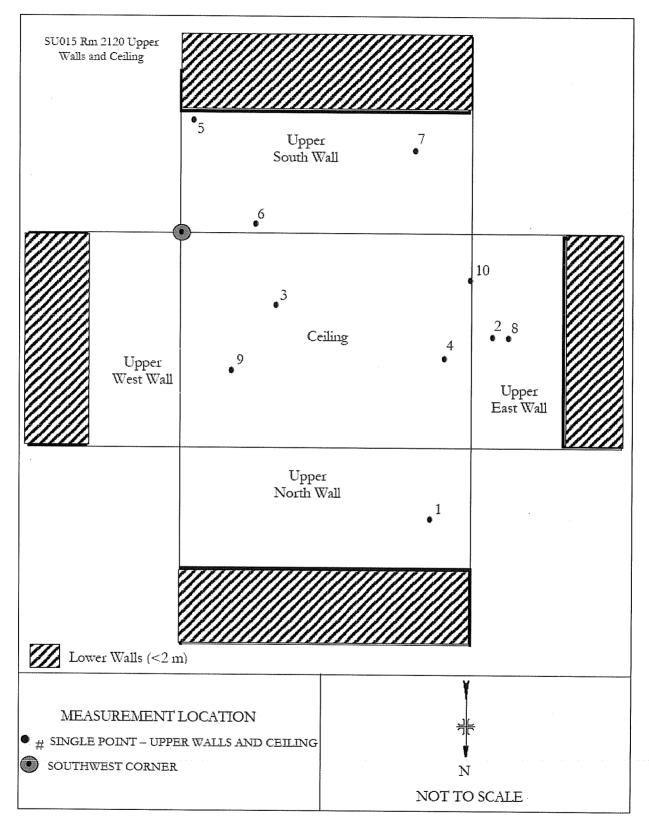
Survey Unit 015, Room 2120 Upper Walls and Ceiling – Direct Measurement Locations
